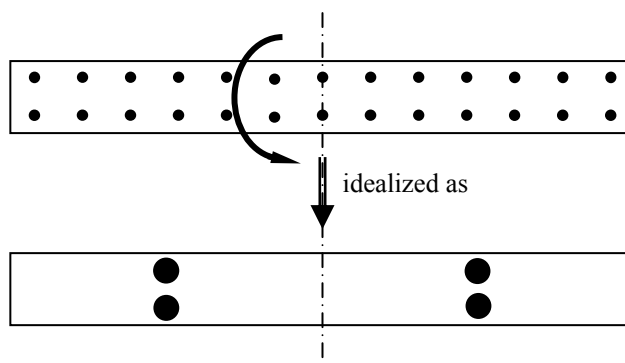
Sectional Design for Wall with Axial Load and Transverse Moment
